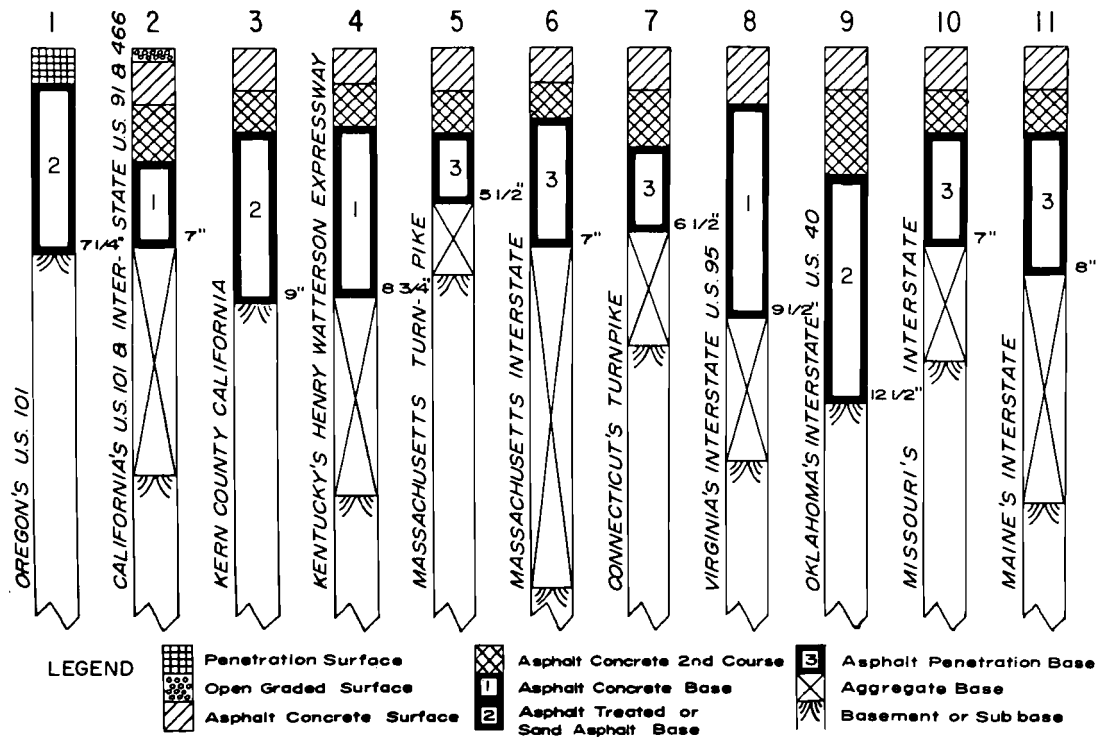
Various Structural Sections of Asphalt Concrete Base Designs
